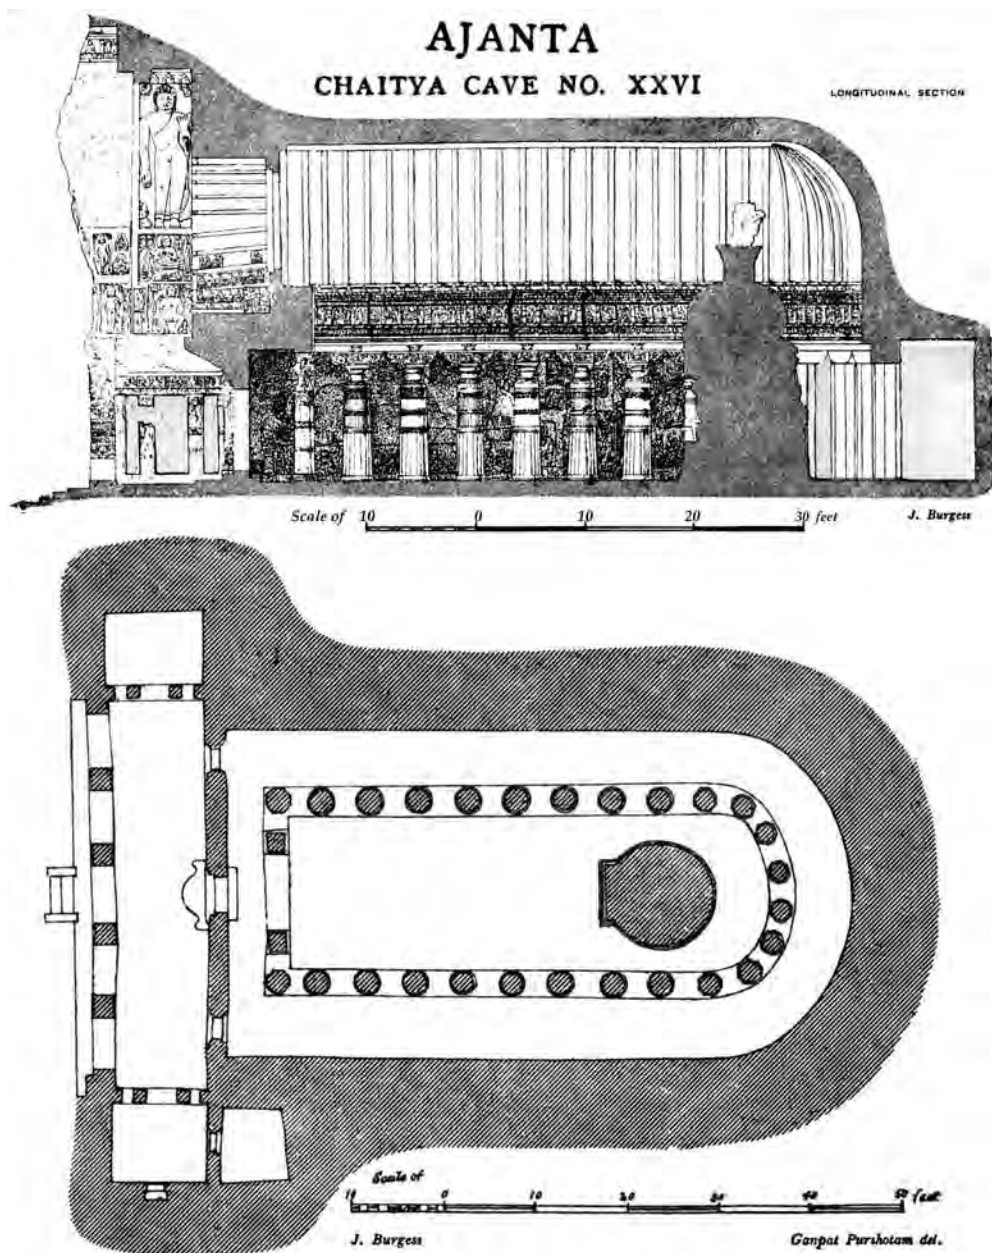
Ajanta 26 plan and longitudinal section (CTI 37; BCT 36)
